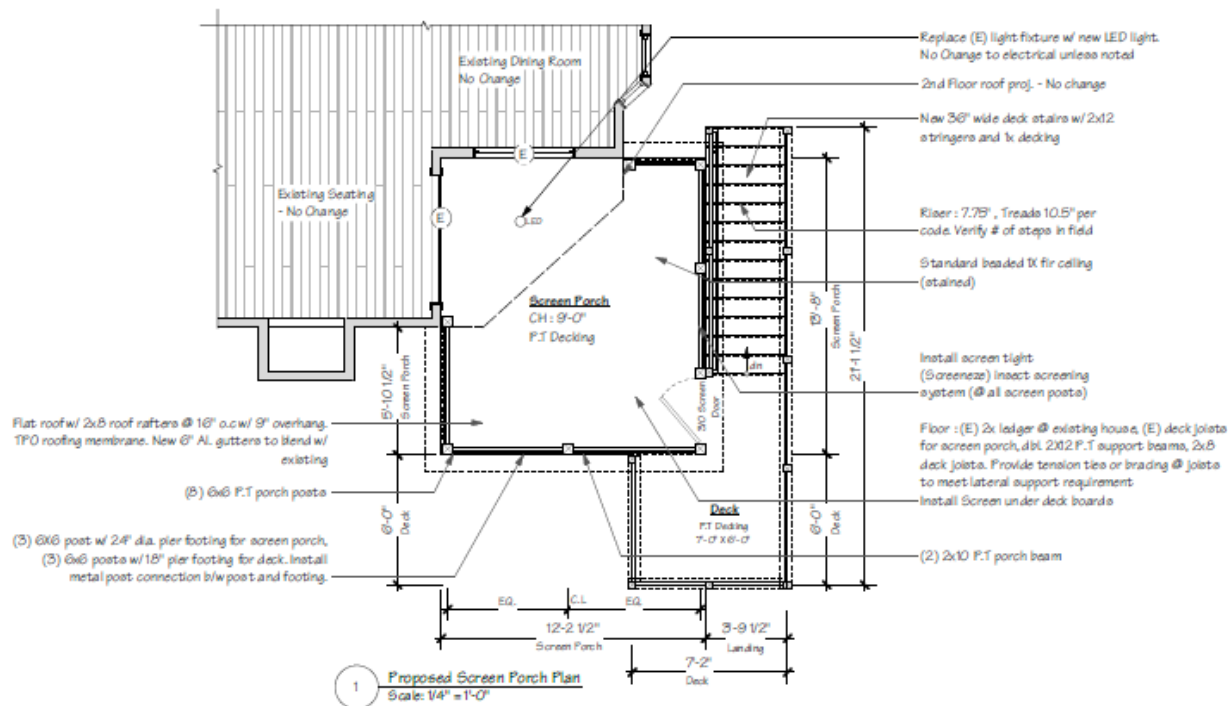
The proposed plan for the porch, deck, landing, and stair.
